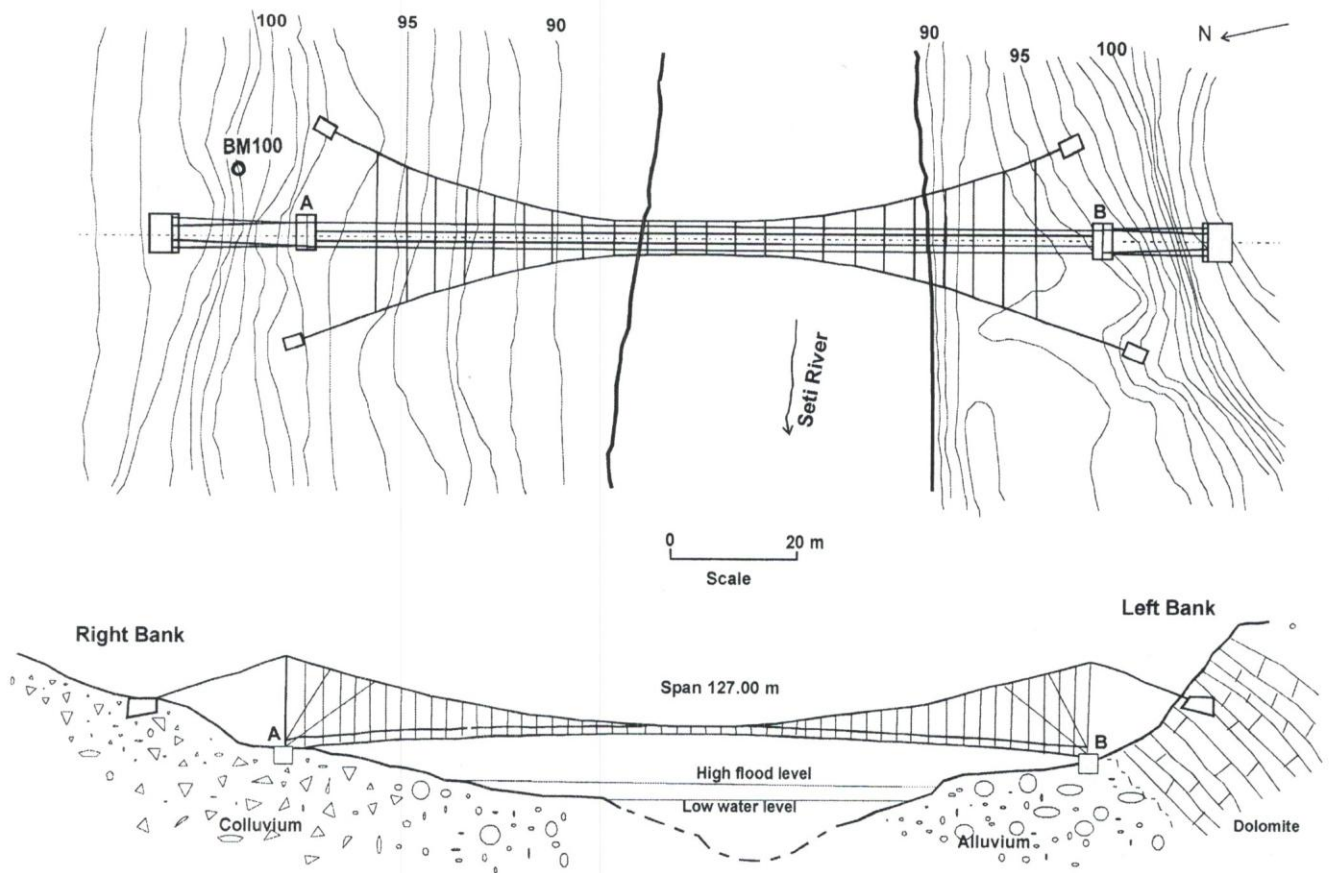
General layout of the Listra Bagar Bridge with cross section view (modified after HEET 1998)
